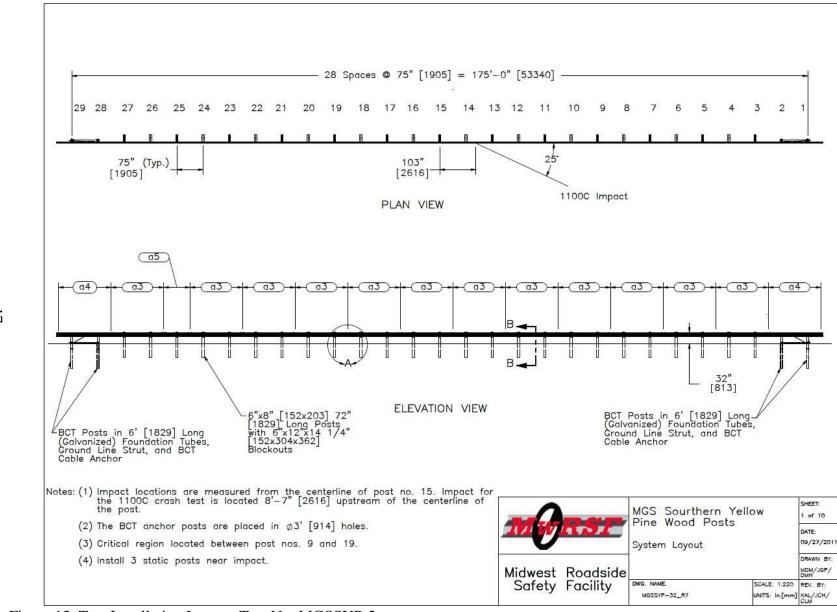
Test Installation Layout, Test No. MGSSYP-2
